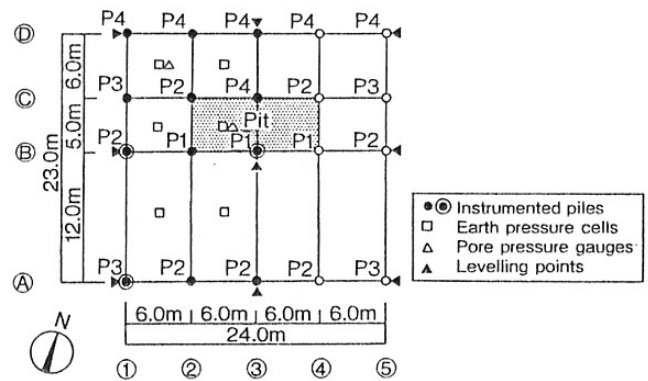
Foundation plan with layout of piles (Yamashita et al., 1994)
